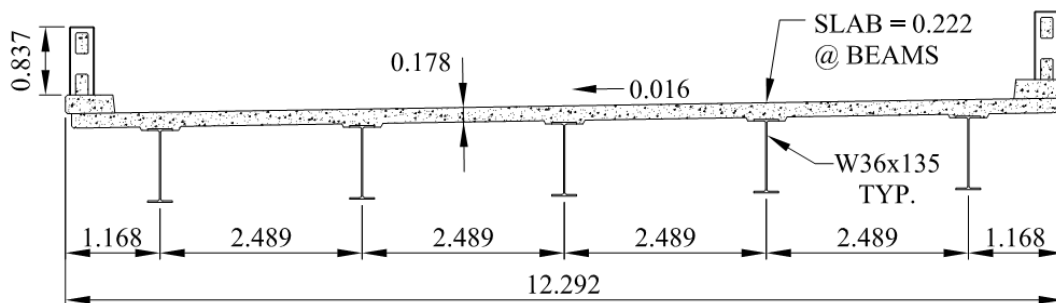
I-40 westbound over 4th Avenue: typical cross-section (m)
